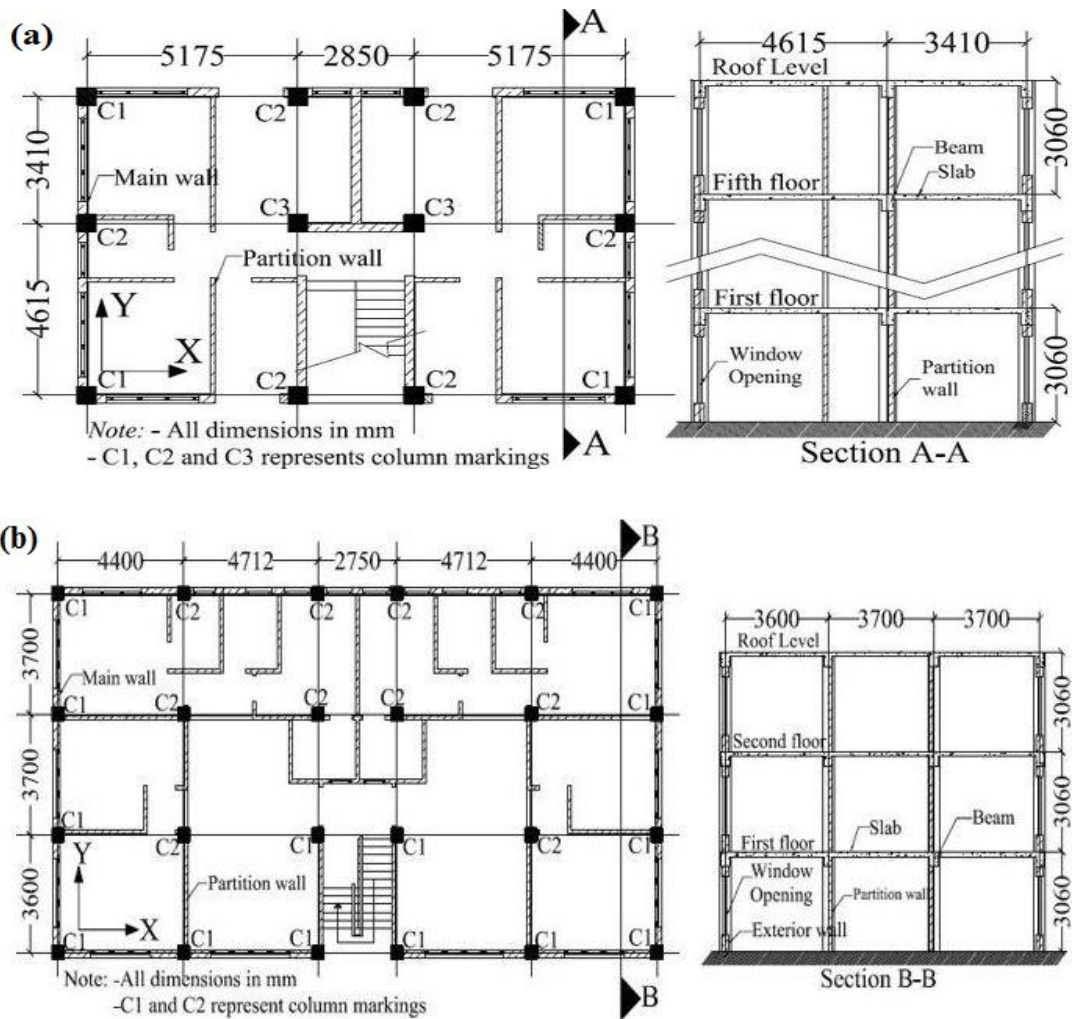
Plan and sectional elevation of typical buildings, (a) 6 storey and (b) 3 storey buildings.
